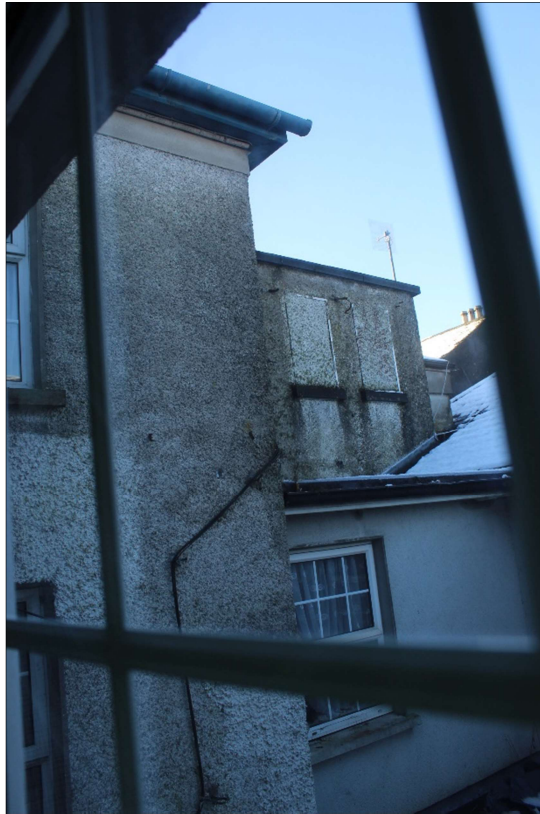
Rear elevations of extensions to northern side of western, street-fronting building on subject site
